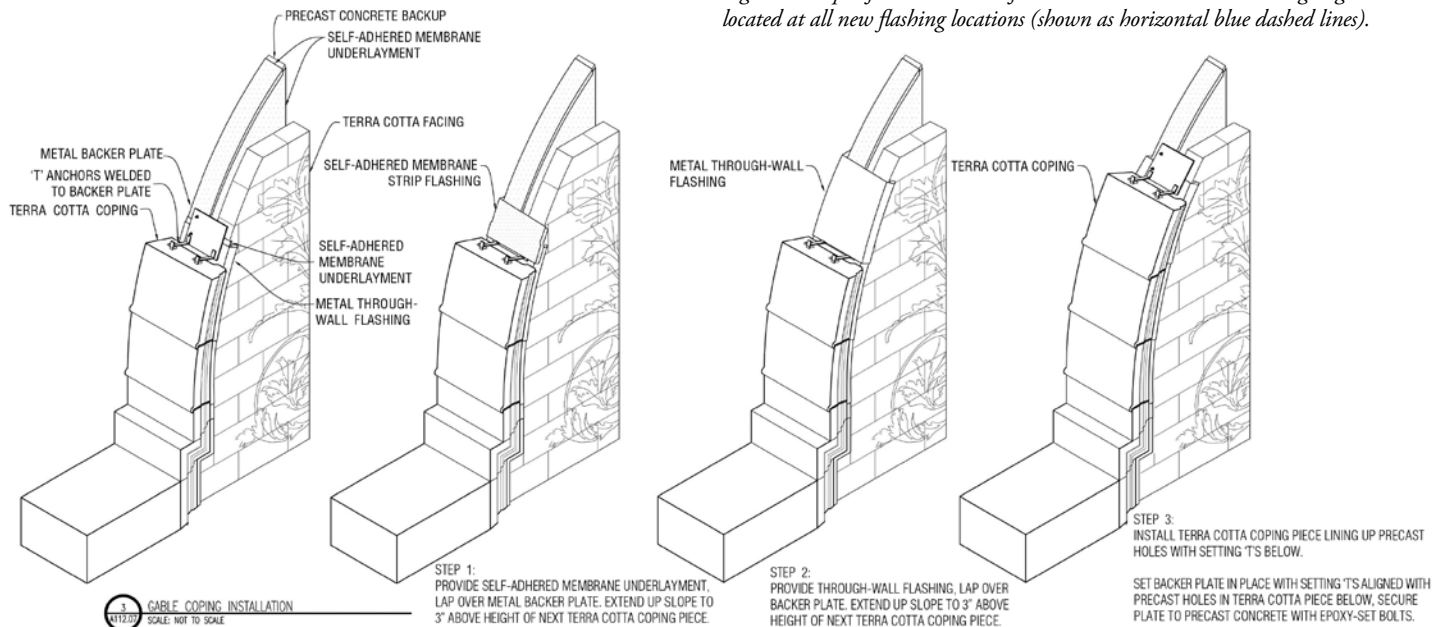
Sequence for installation of waterproofing, flashing, and terra cotta cladding.
